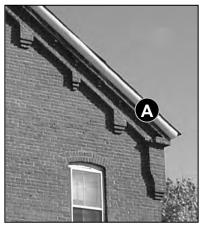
120 Benmont Ave. The eave detail here creates a intricate shadow and helps water drip away from the surface of the façade.
